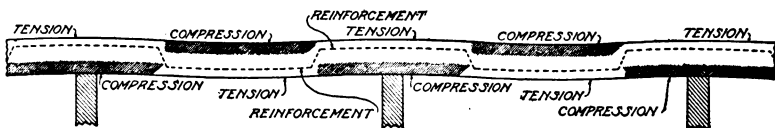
Series of Connected Beams or Slabs Continuous Over Supports and Deflecting Under Load
